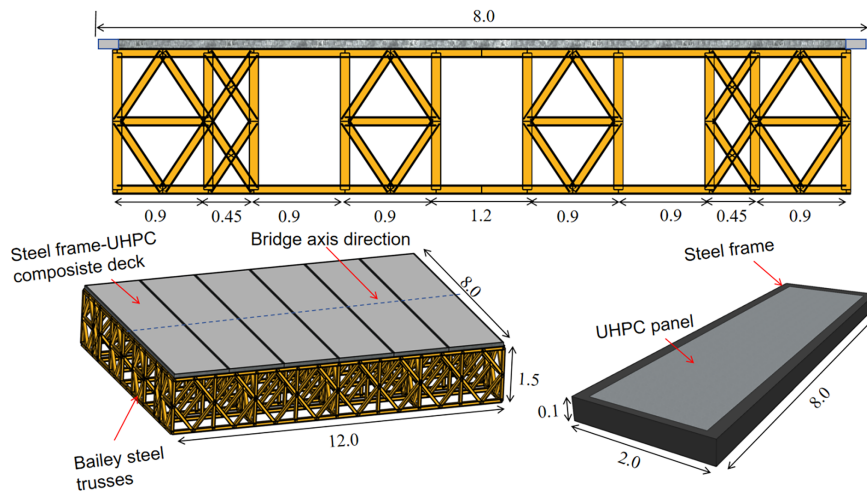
Arrangement and configuration of investigated trestle (Unit: m).
